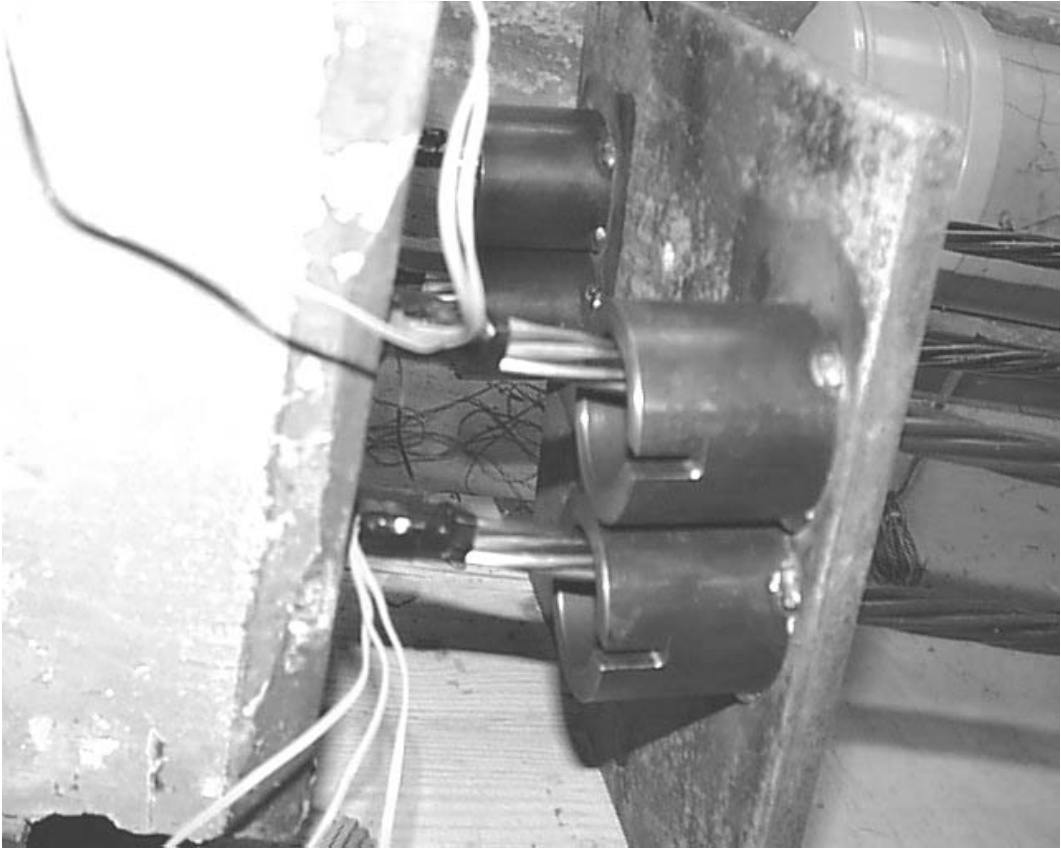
Las Vegas Box Girder Strain Gage Plate
